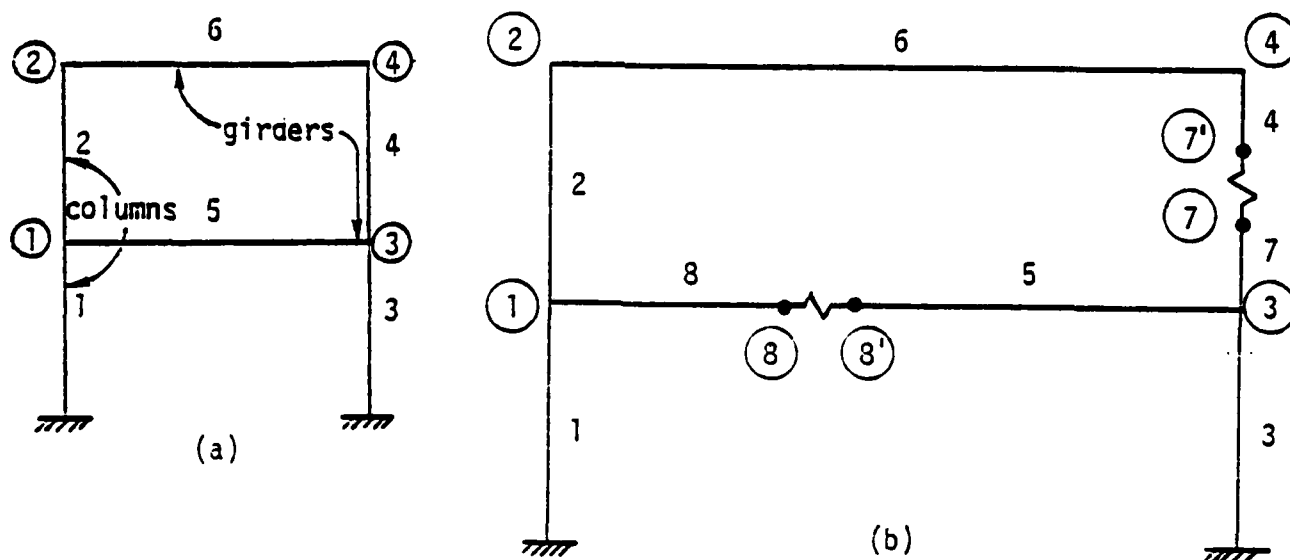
Two-story, Single Span Frame (a) with No Crack, (b) with Two Cracks.
